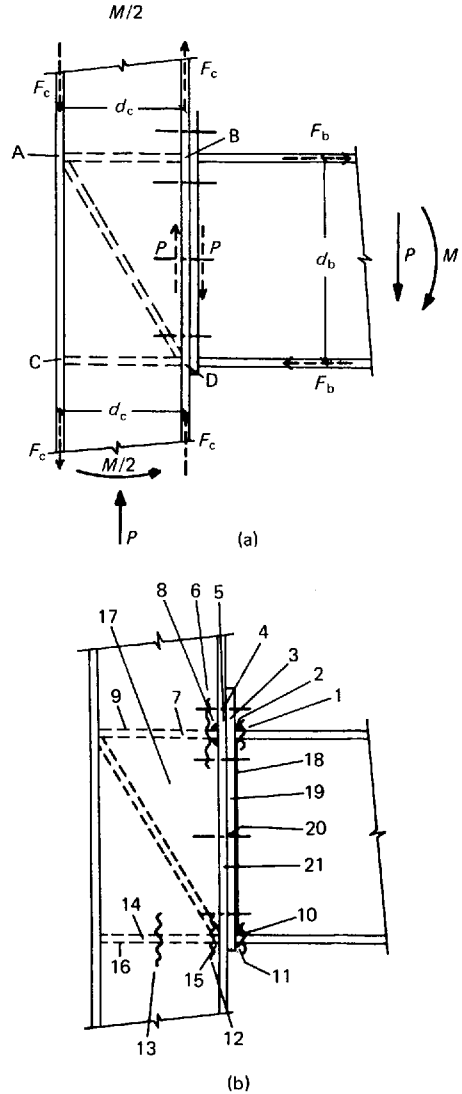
Analysis and strength assessment of an exterior beam-to-column connection
